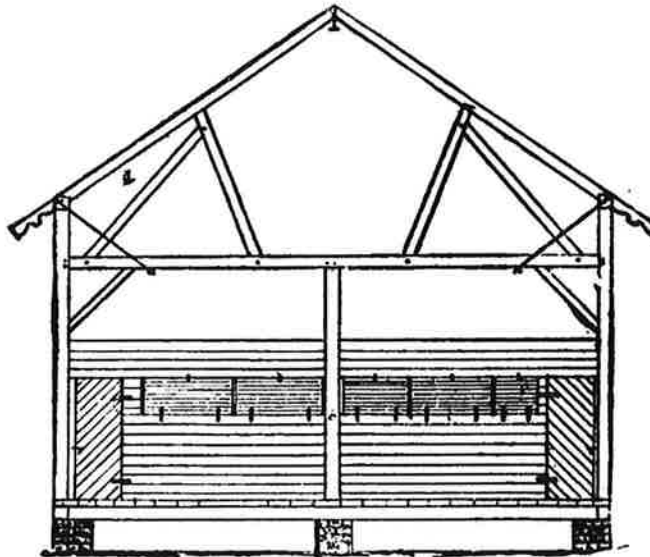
STABLE SIDE OF DRIVEWAY.
